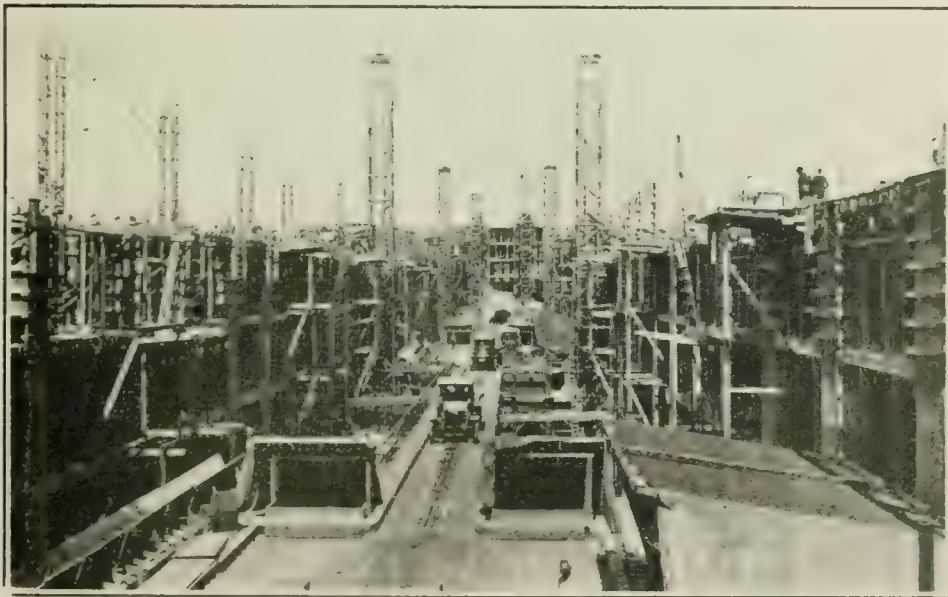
VIEW OF COURT, BUILDING B, SHOWING MATERIAL TRESTLE AND AREA OVER BINS.
